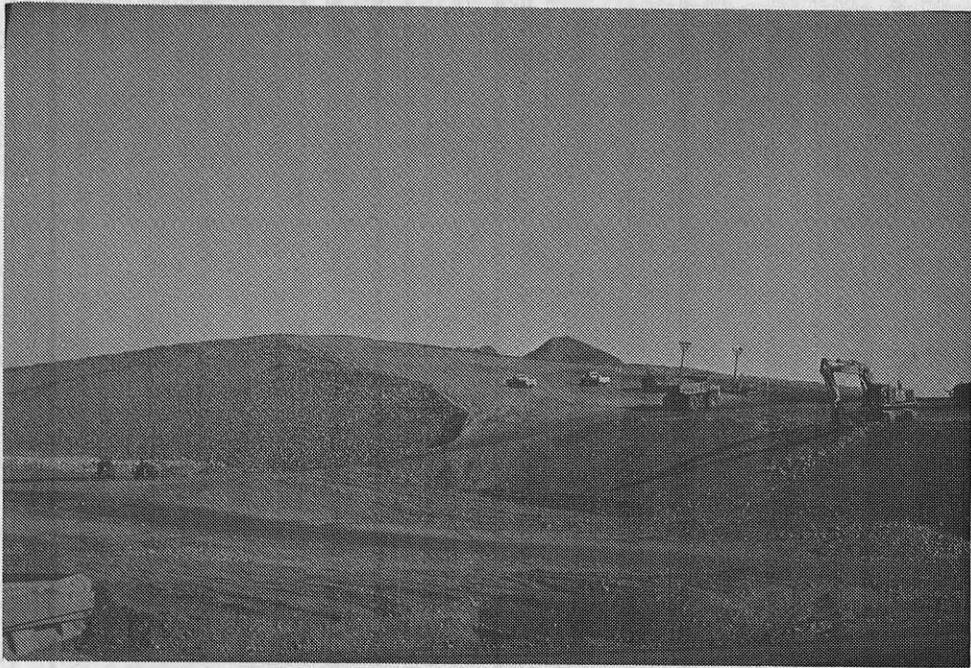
Stage III dam embankment construction at approximately elevation 1420. Completed stage II embankment with upstream stone protection at left. October 1984
